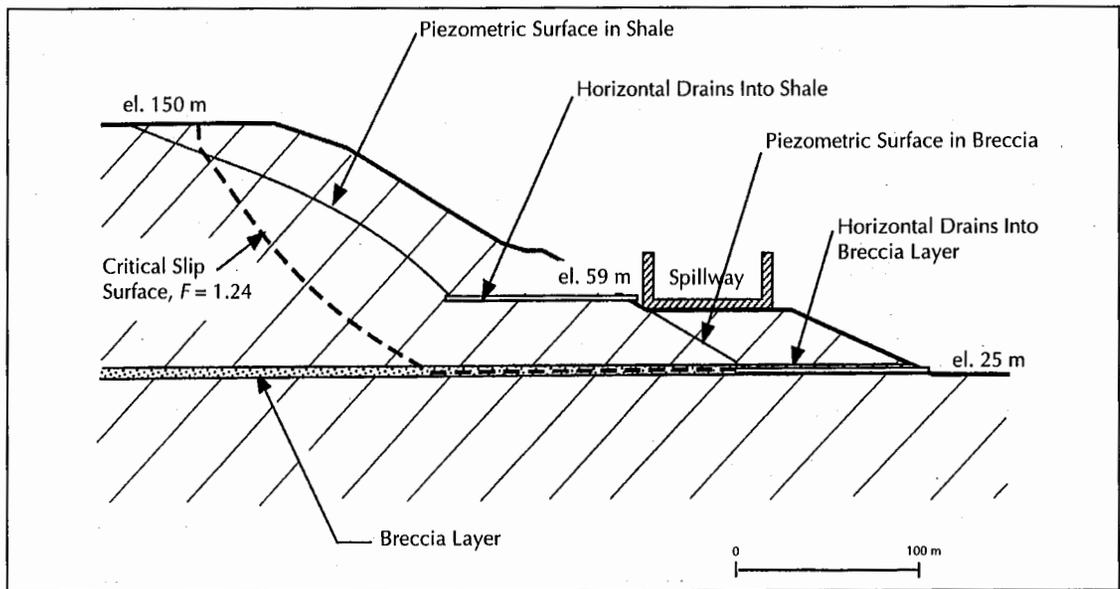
Drains in the right abutment of La Esperanza Dam.
